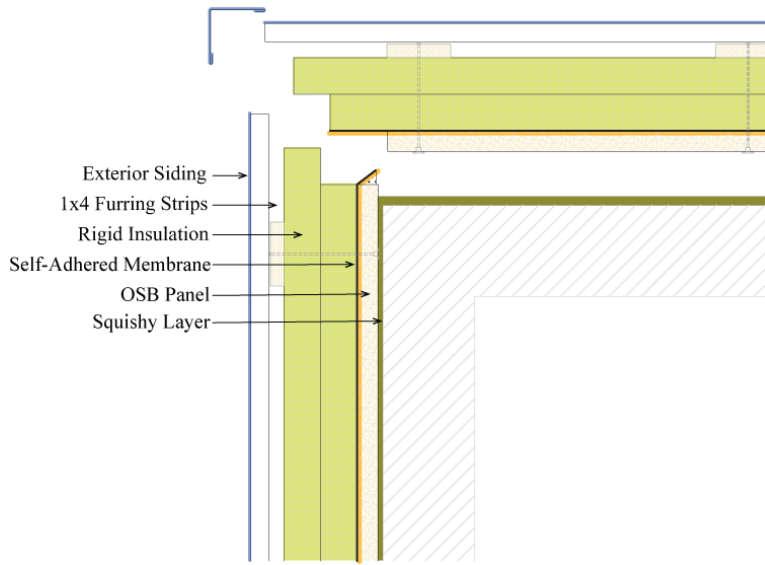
Outside Corner Connection – Blind, Option 2 - Plan View
